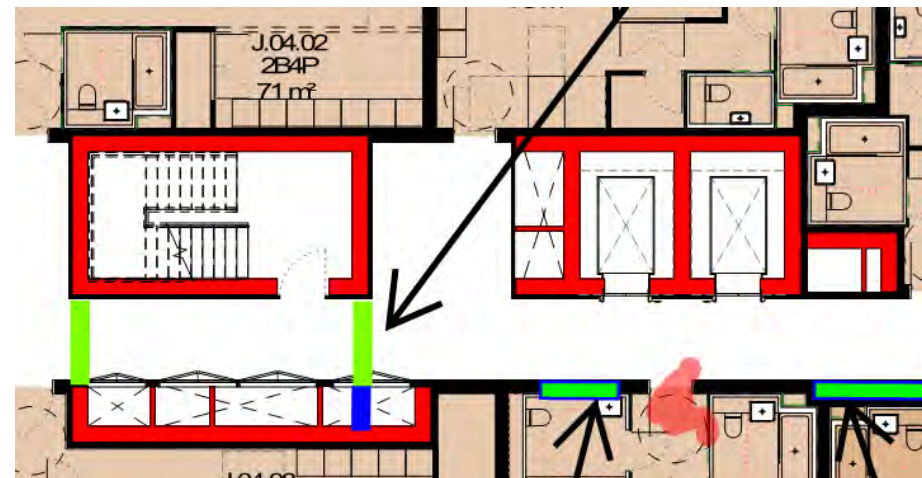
Block I core lateral stiffness elements - shear wall/link beams and stair/lift shaft arrangement
